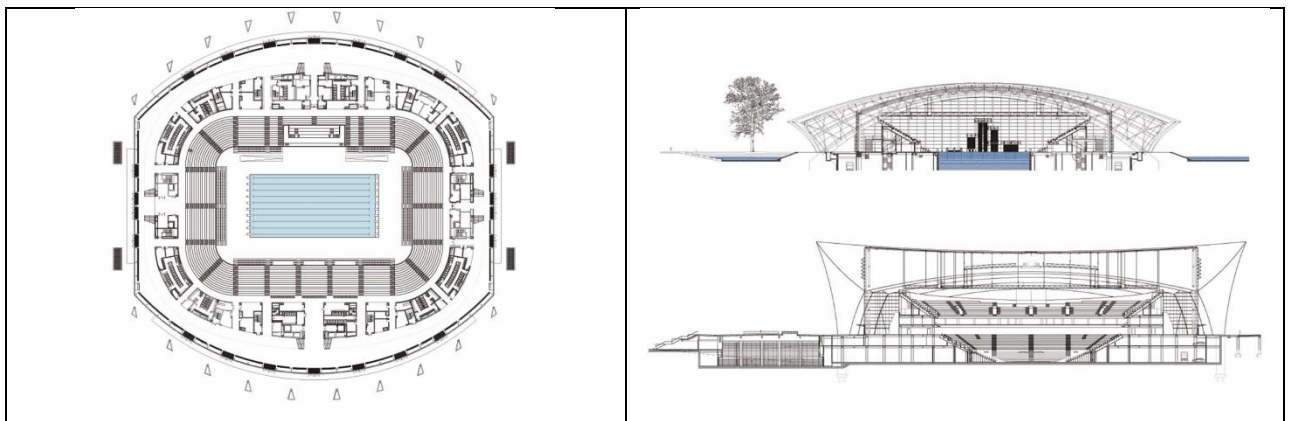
Floor Plan and Sections of the Shanghai Oriental Sports Center
